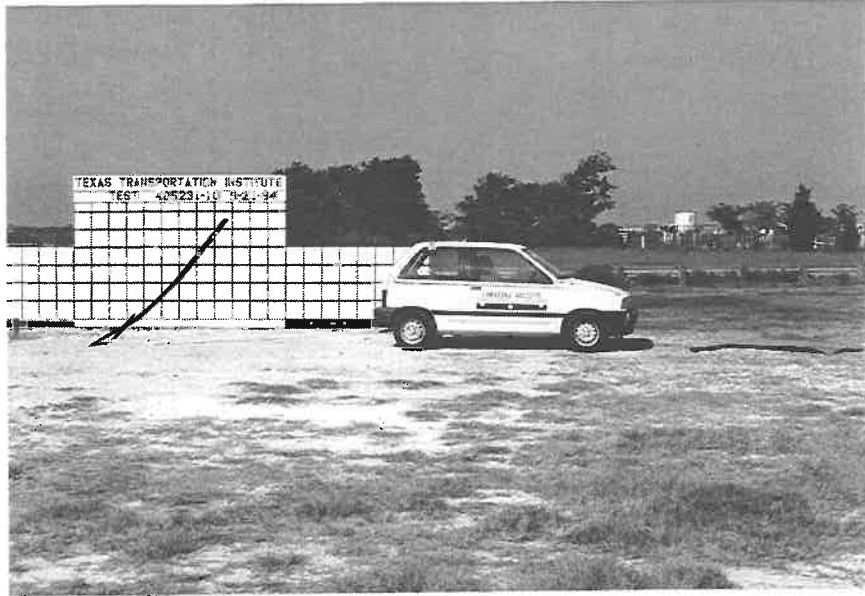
Final rest position of the sign installation and vehicle (test 405231-10).
